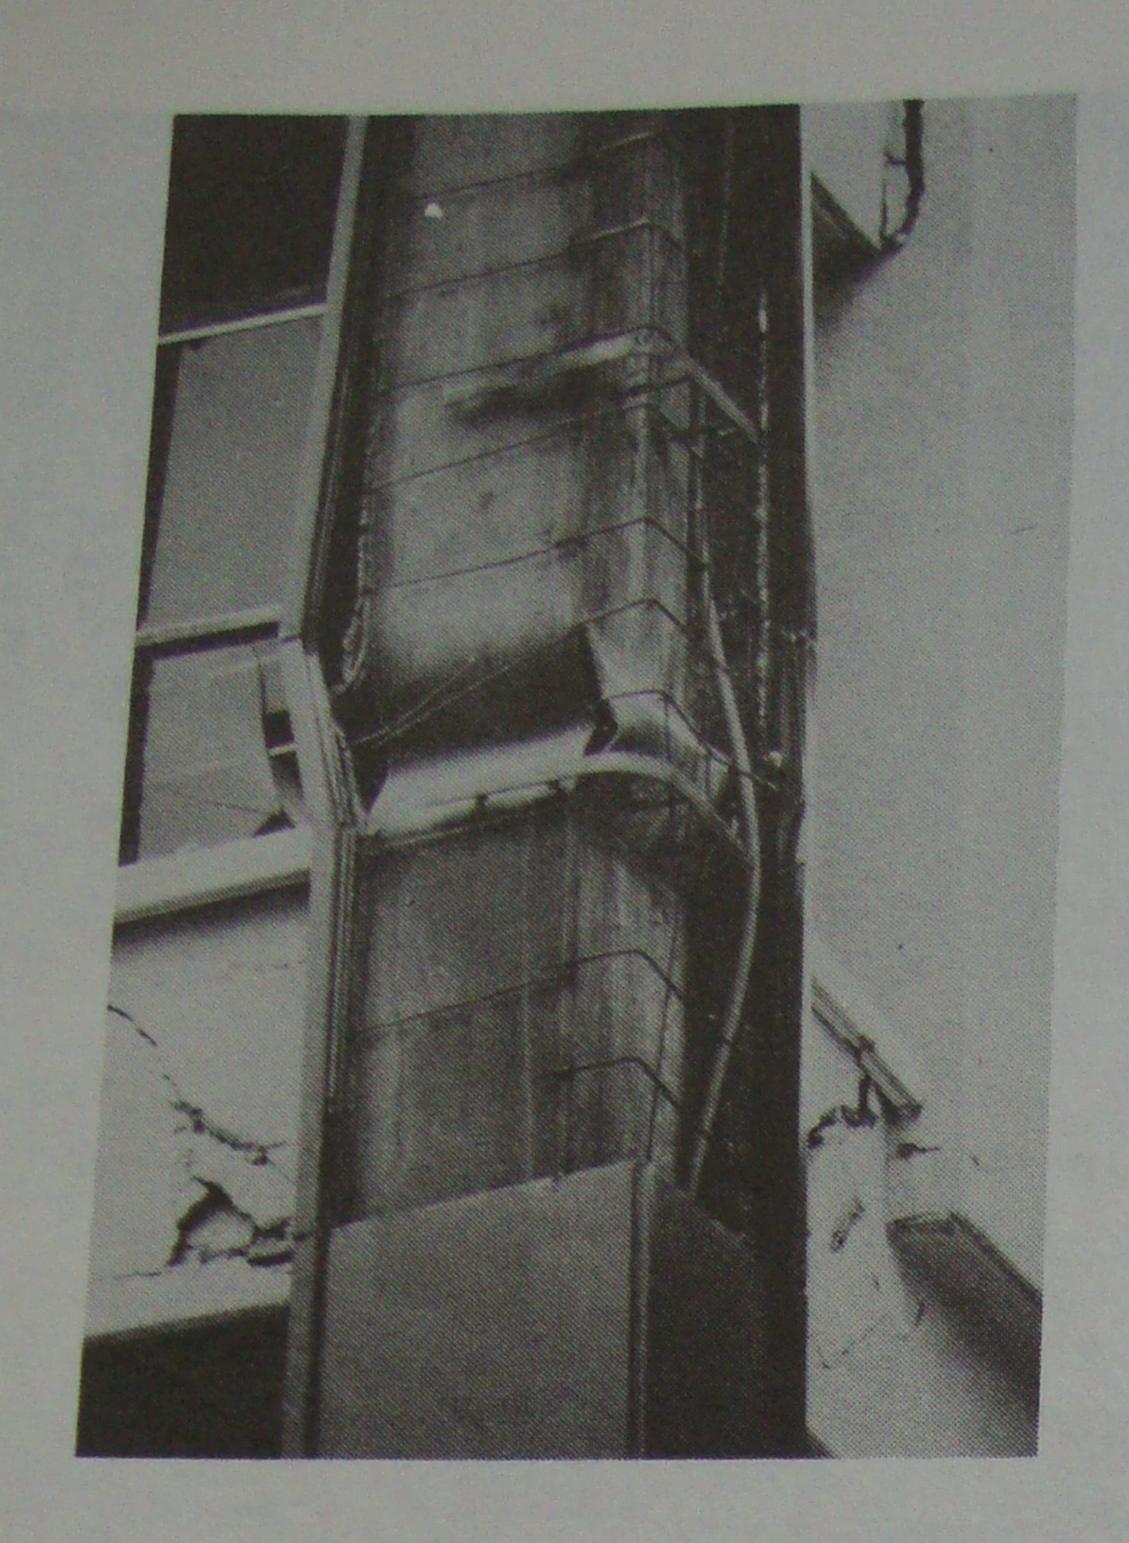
Close-up of severely damaged built-up tubular steel column (Mitchell et al. 1986a&b).
